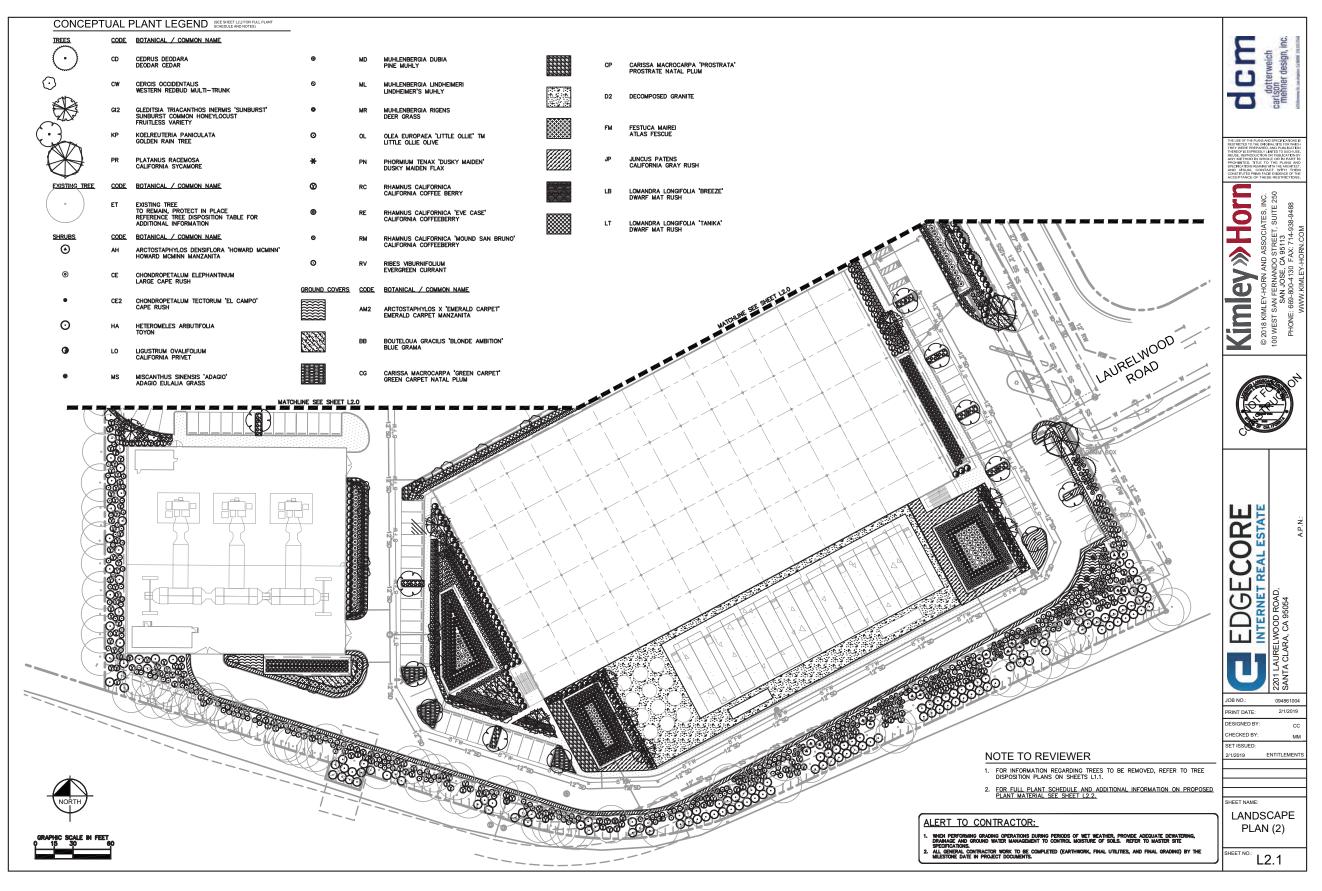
Conceptual Landscaping and Drainage Plan Laurelwood Data Center Santa Clara, California
